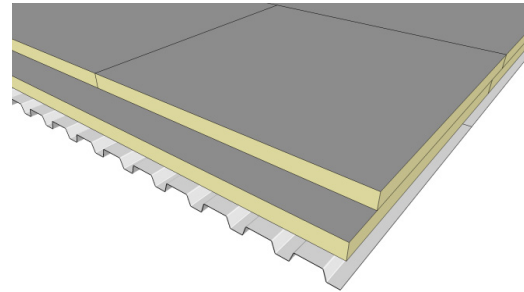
Duro-Guard ISO II Flat On Steel Deck
